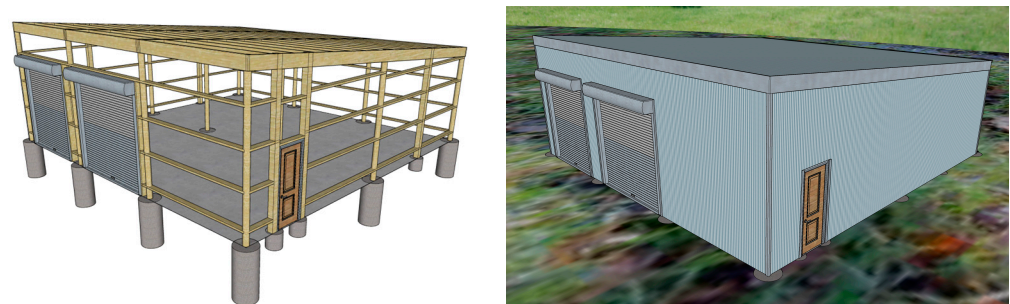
3D model of the timber-framed warehouse used in the case study. The left image shows the structural framing with exposed foundation, columns, and framing elements. The right image presents the completed external envelope, including wall cladding, roof, roller shutters, and personal access door. This model was used to calculate material quantities and standardised inputs for LCA software analysis.
